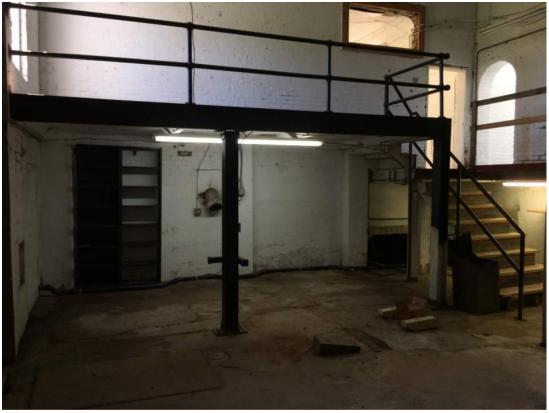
Lower Level North Room, Viewed from Northeast Corner to South Wall
